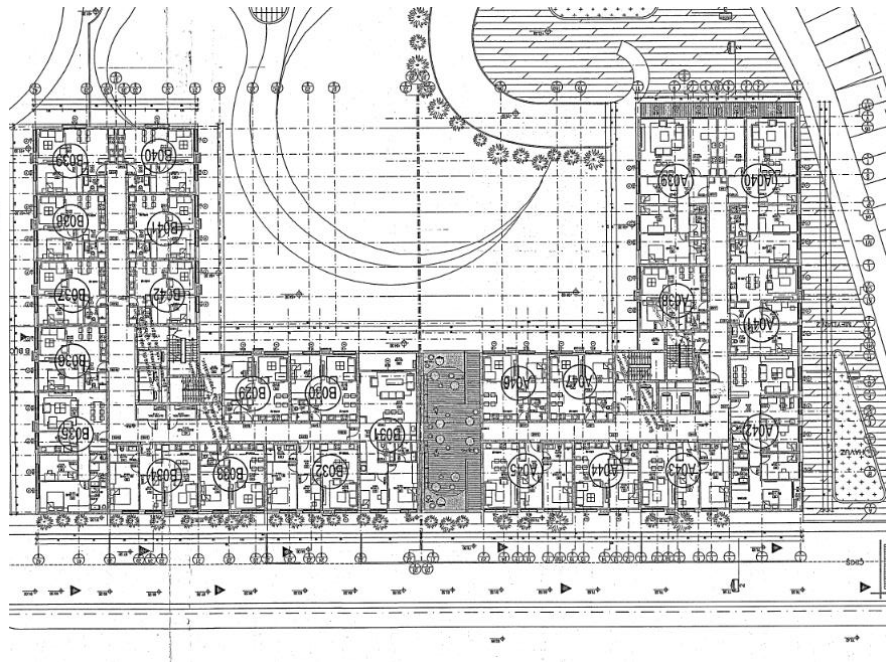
Floor Plan showing the U-shaped building used to run the simulation
